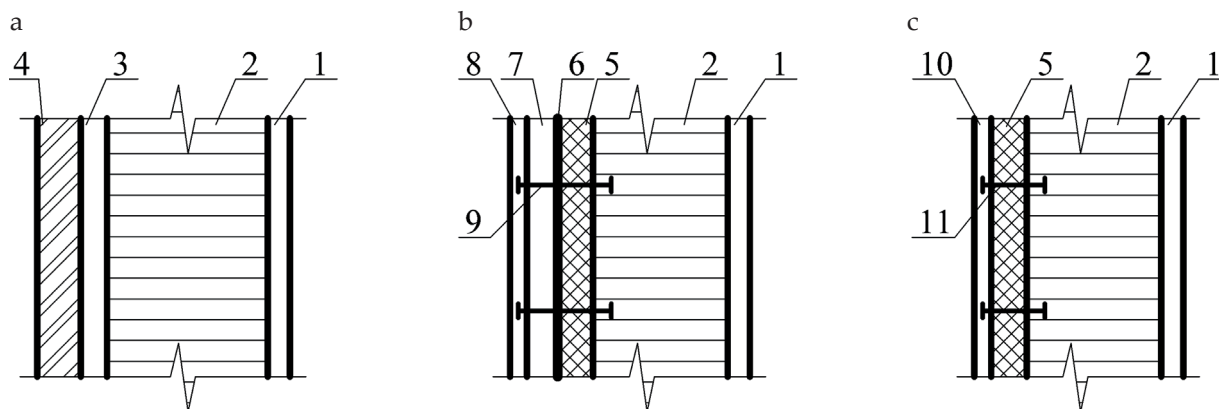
Constructive solutions regarding the external walls of high-rise buildings: a — external wall made from masonry with lightweight concrete stones; b — external wall with a ventilated facade; c — external wall insulated by a facade system with thin-walled plaster: 1 — interior plastering; 2 — masonry of lightweight concrete stones in cement–sand or warm mortar; 3 — non-ventilated air space; 4 — facing ceramic bricks; 5 — heat-insulating material; 6 — windproof membrane; 7 — ventilated air space; 8 — ornamental panel; 9 — metal bracket; 10 — surface finish layer of the facade system; 11 — plastic dowel.
